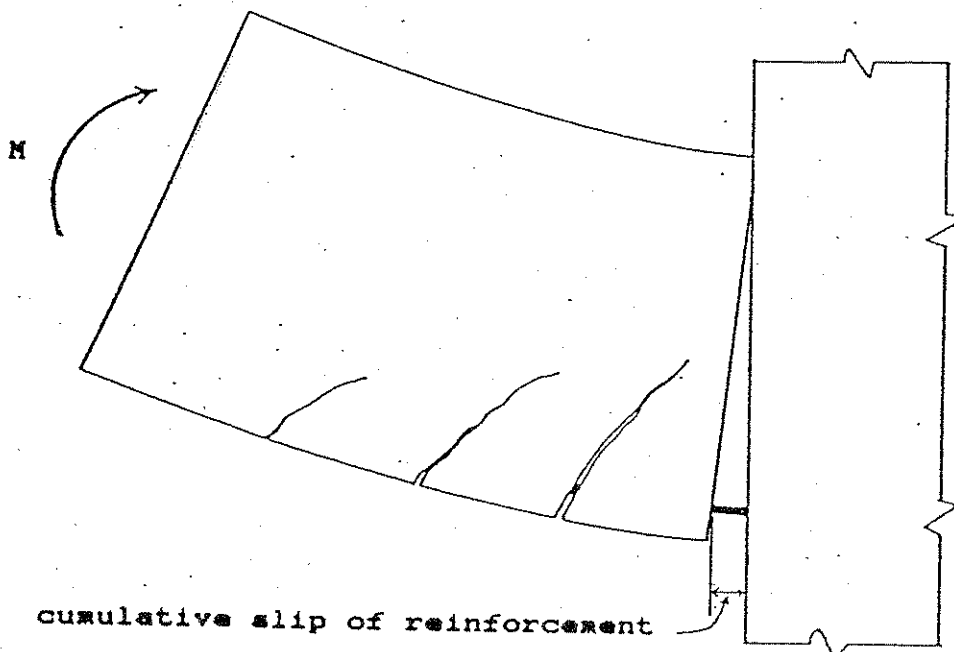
Bar Slip Mechanism in a Reinforced Concrete Element.
